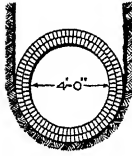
Circular Brick Sewer, Ingersoll Run, Des Moines, Iowa.
